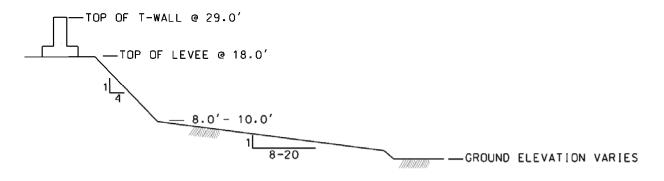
Typical Levee Design Cross-section MRGO Levee/Floodwall Combination (SB13)
